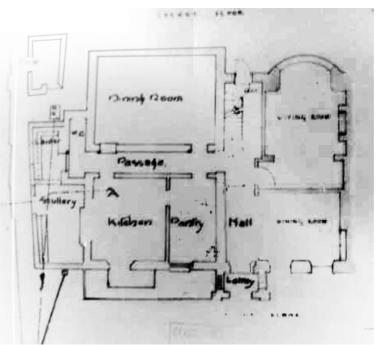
1913 Drainage Ground Floor Drainage Plan (Camden Archives)
